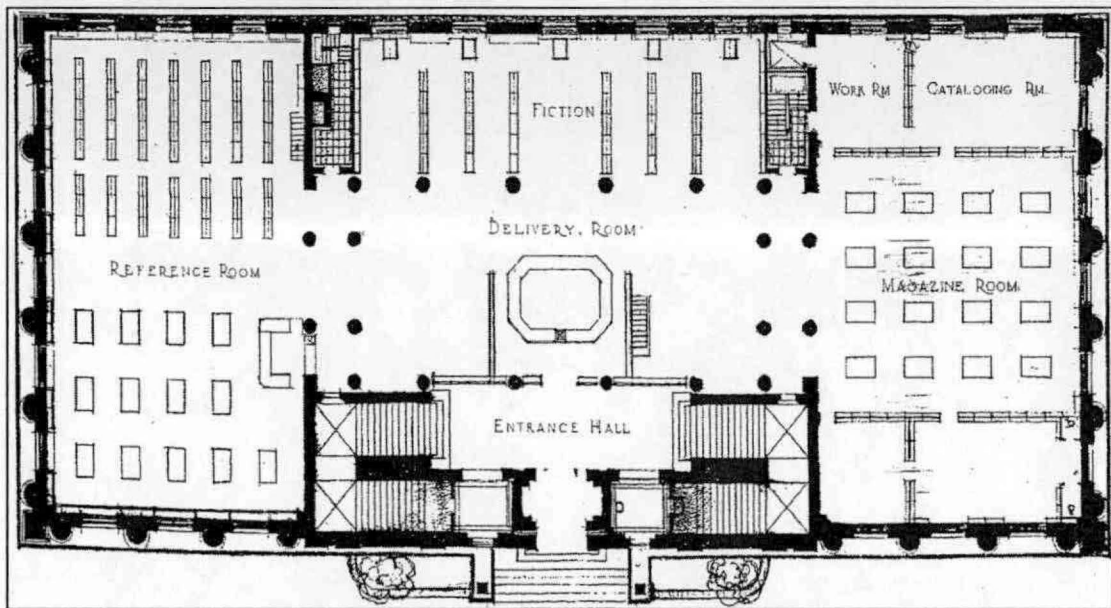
Wilmington Library First Floor Plan, The Architectural Review March 1922
